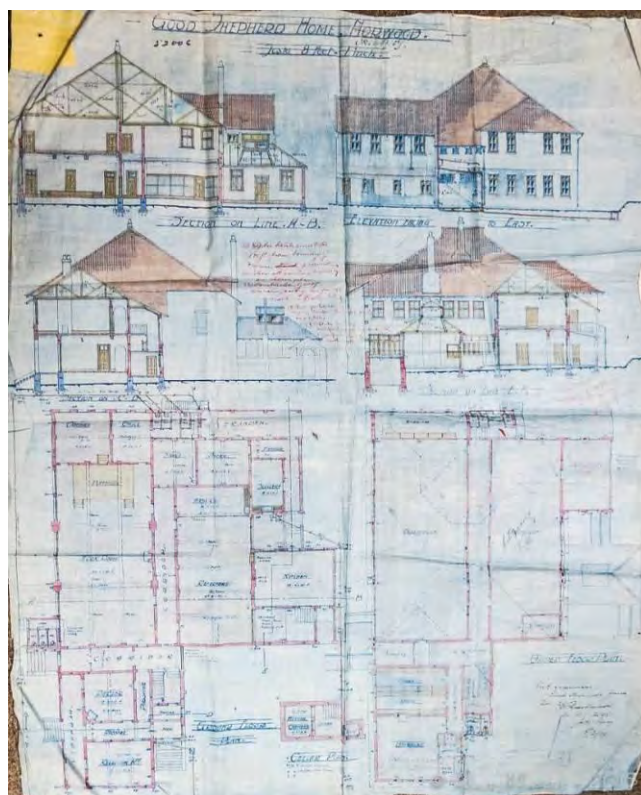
Plan for proposed Good Shepherd Home on Stand 144 in Orchards
